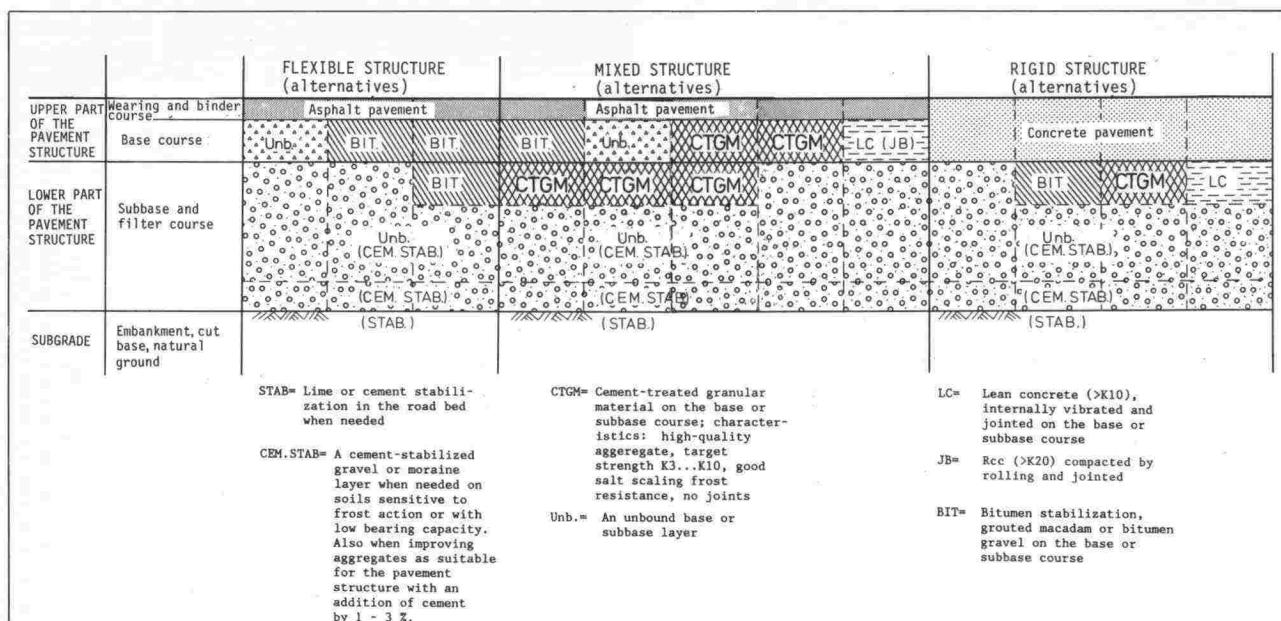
Cement-treated materials and cement stabilization in pavement structures—a principal drawing
